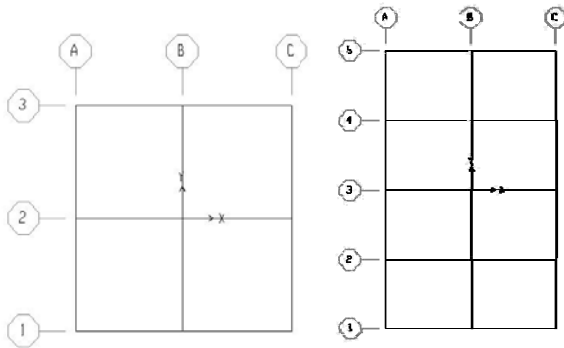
Plan of the 6 Storey Rectangular Building and 4 Storey Square Building respectively.
